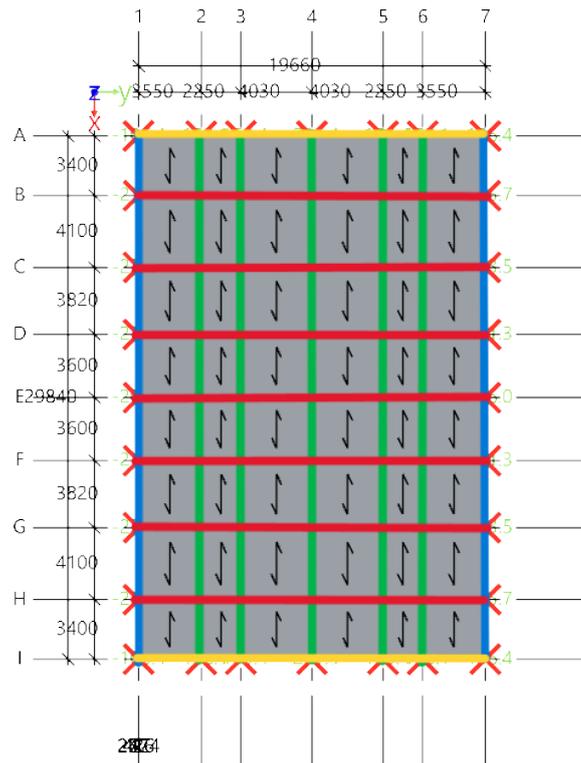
Primary internal beams (red), primary façade beams (yellow), secondary internal beams (green) and secondary façade beams (blue)
